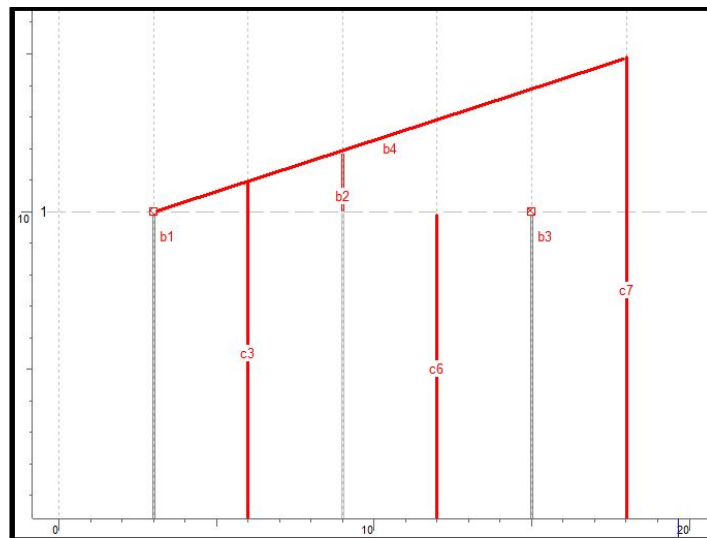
Sloped Beam Supported by more than 2 other Beams Side View
